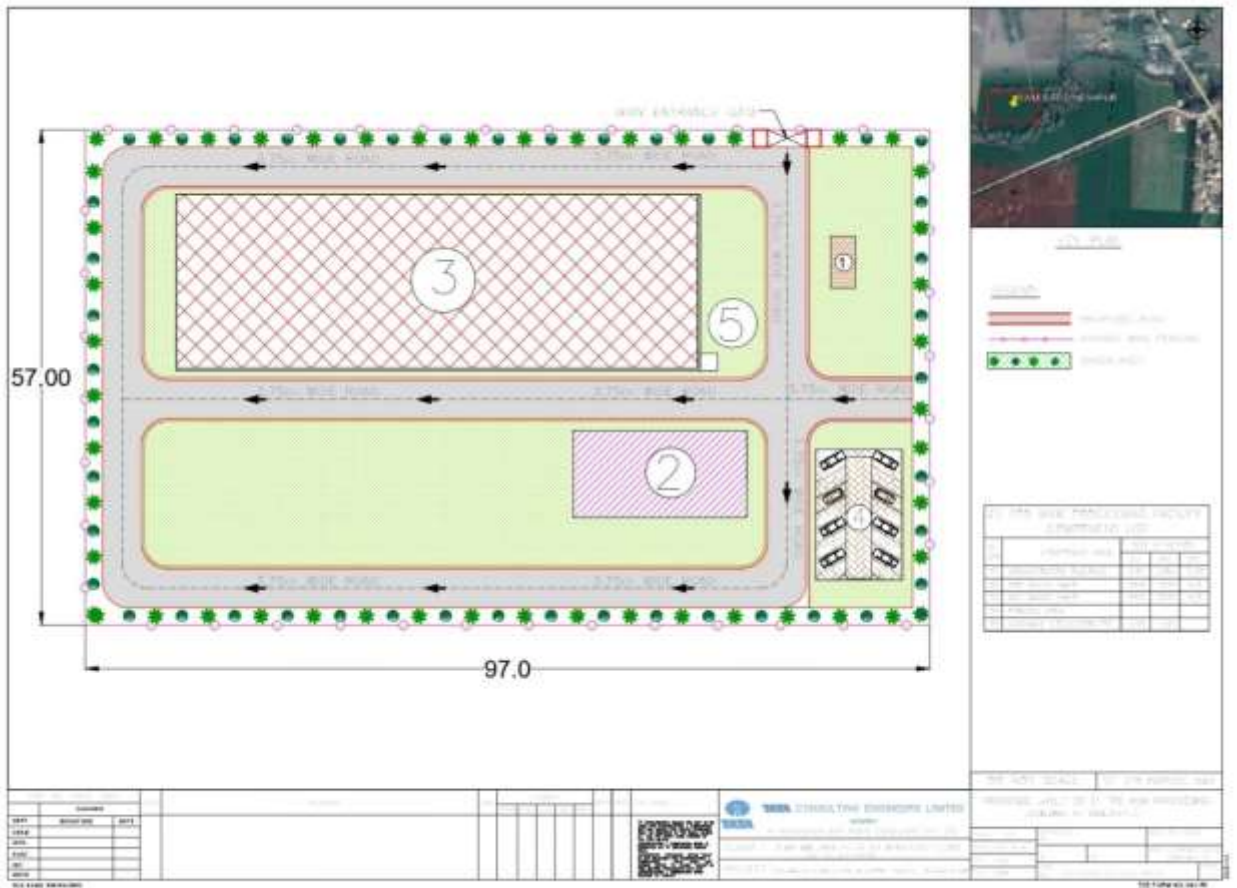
Proposed Project Layout Plan - Dineshpur
